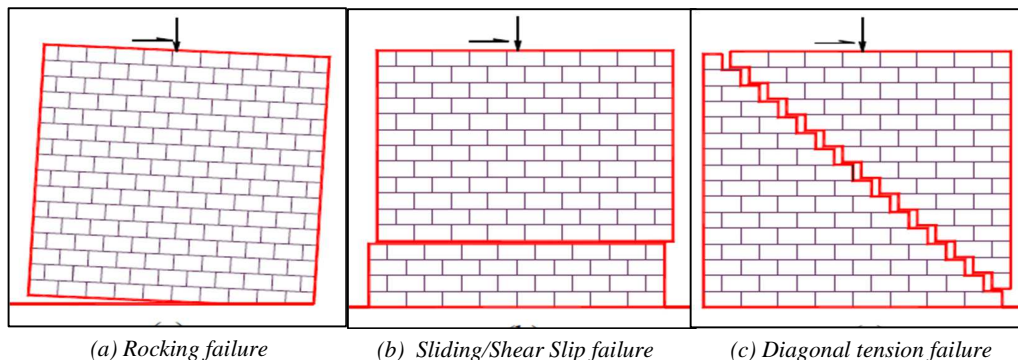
In-Plane Failure Mode of a Laterally Loaded URM Wall
